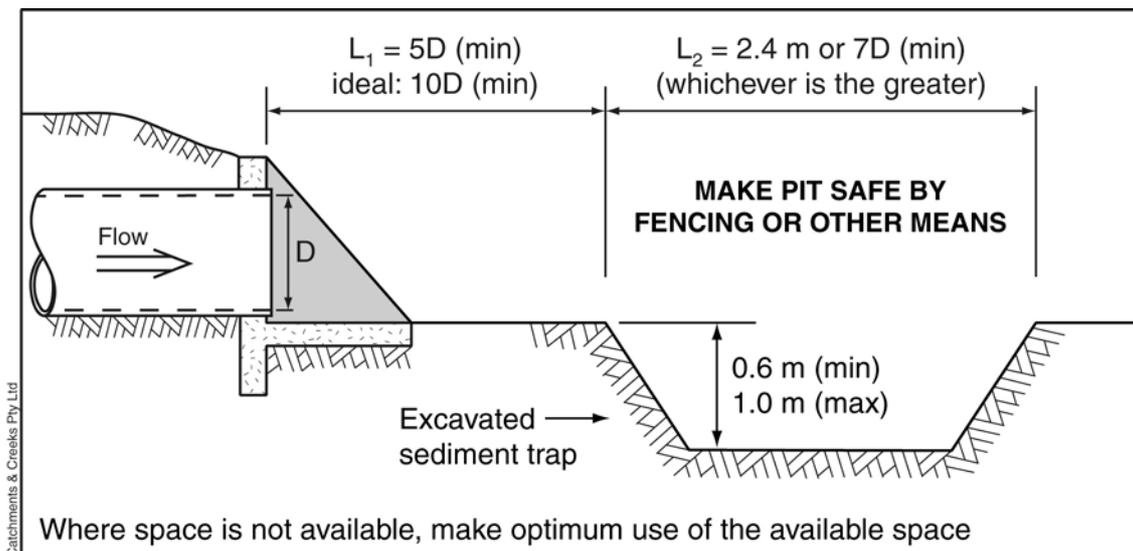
Ideal minimal dimensional requirements of excavated sediment trap located downstream of a stormwater outlet
